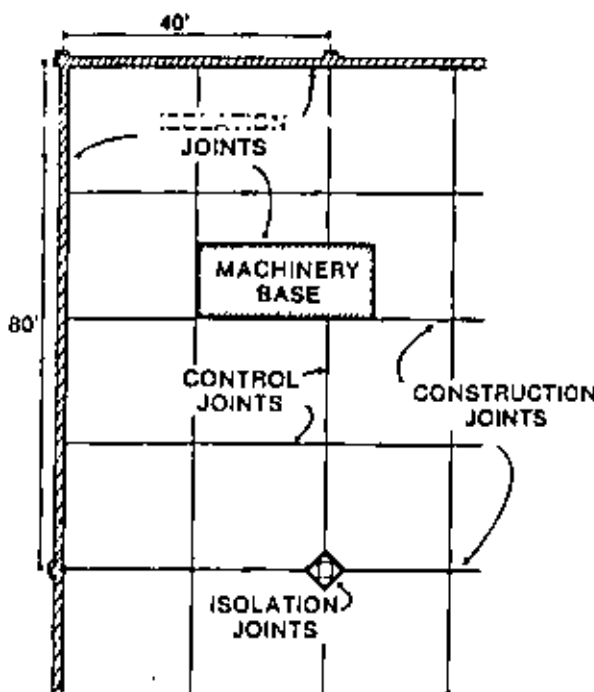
Typical joint layout for concrete floor on ground with no reinforcement.
